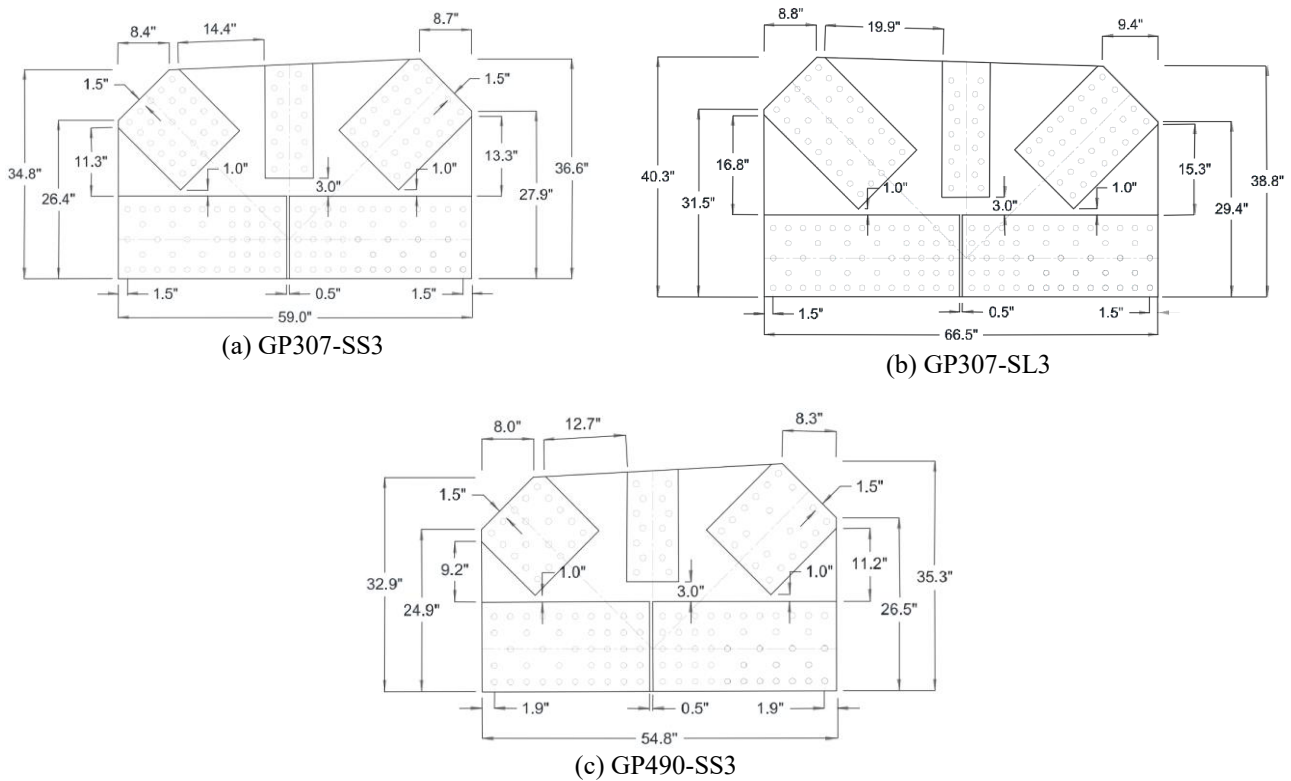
Cross-sections of the gusset plate specimens (Mentes 2011)
